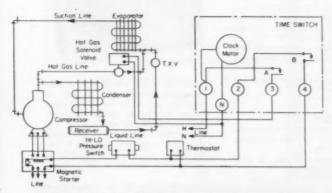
HOT GAS DEFROST wiring diagram shows hot gas line teed into the evaporator ahead of the thermostatic expansion valve, and both a hot gas solenoid valve and a time switch added to the system.
